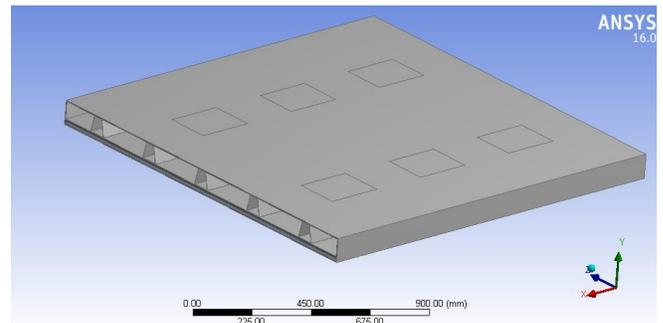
Trapezoidal bridge deck with steel and polyurethane
